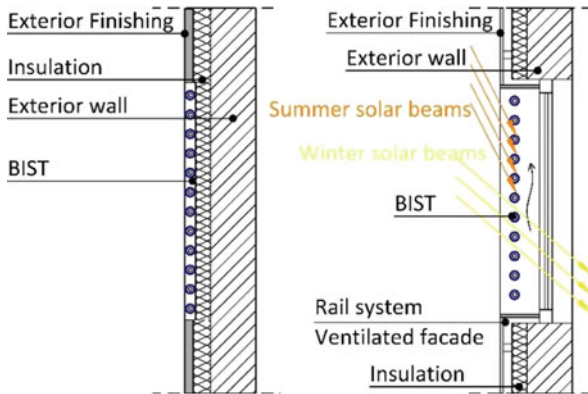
Vertical section through exterior wall presenting various situations of how BIST can be integrated in a building façade. From the left: 1. integrated in façade, 2. installed in a ventilated façade either as a module or as shading device in front of a window or a balcony
